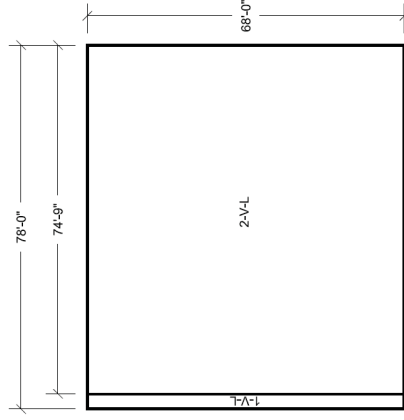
H.6-74: PUMP HOUSE INTERNAL EAST WALL LOOKING WEST
